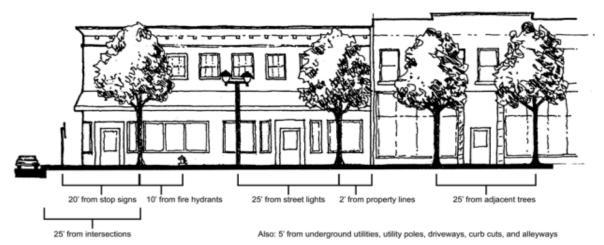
PP&R Urban Forestry Street Tree Spacing
